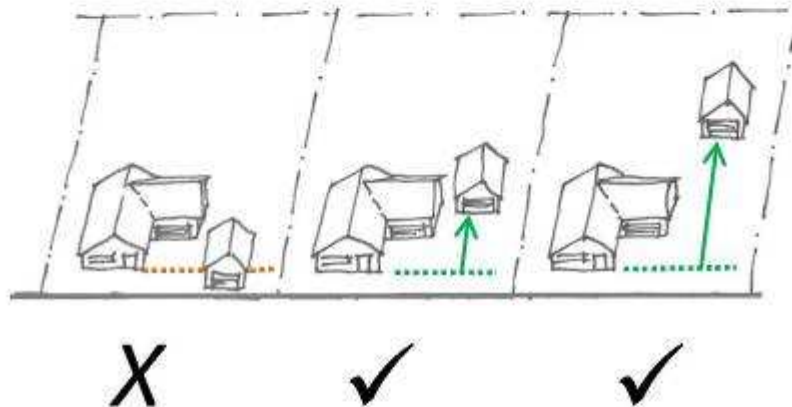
Outbuildings should not be sited any closer to the front boundary than the existing dwelling
